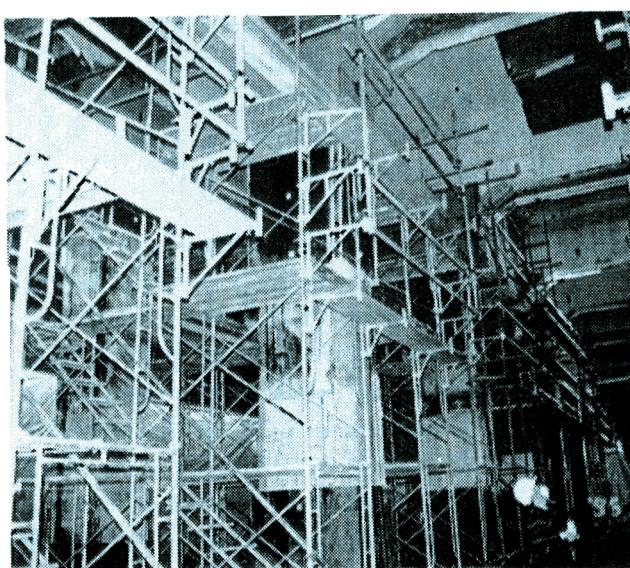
Repair works of the JR viaduct frame at the location of Photo 5
